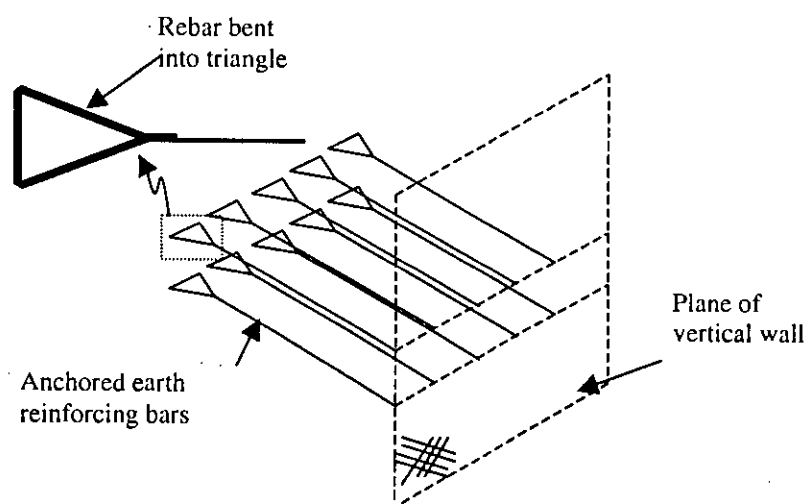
Anchored earth with triangular rebar reinforcement
